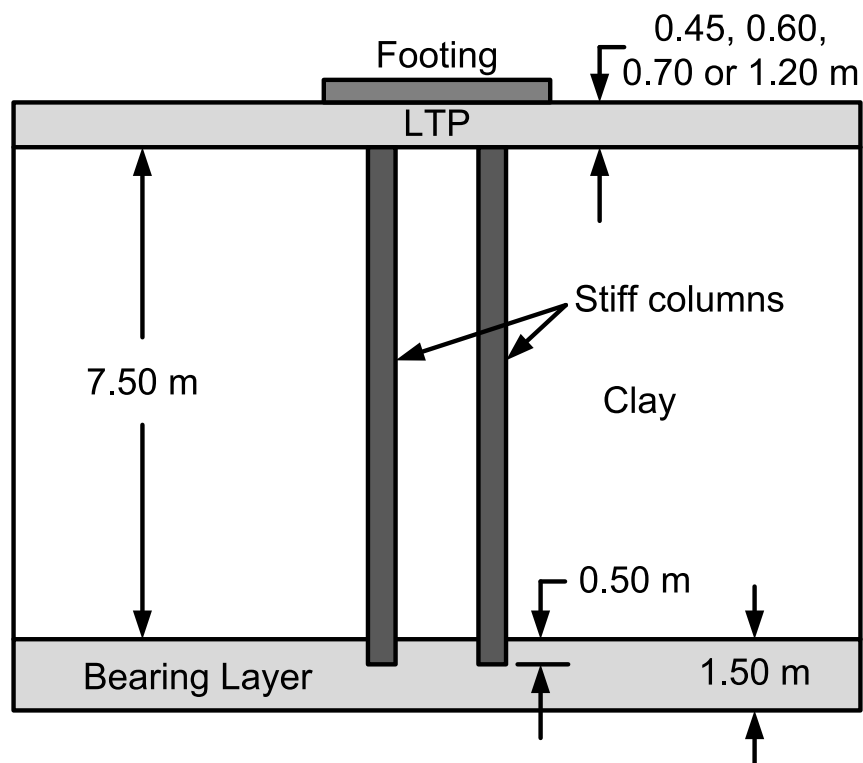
Cross-section of the stiff column-supported footing. Prototype-scale system (not to scale).
